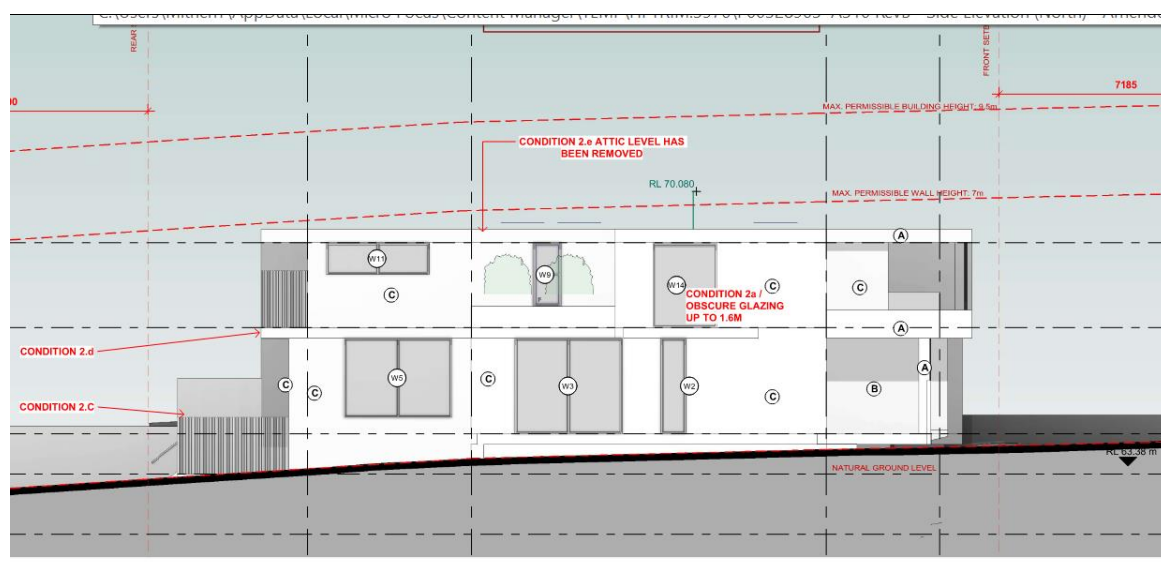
The approved development showing a flat roof design in accordance with Condition 2(e) imposed by the RLPP (northern elevation)
